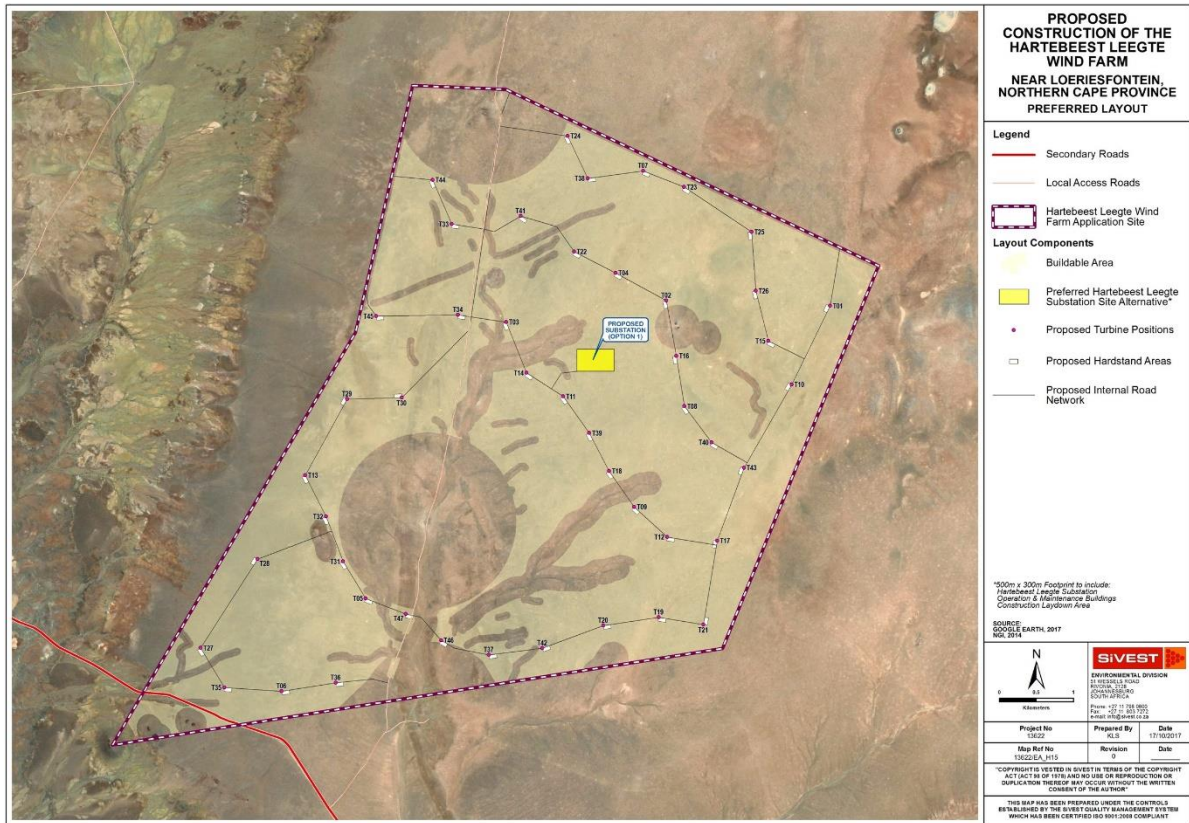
Proposed Preferred Hartebeest Leegte Layout
